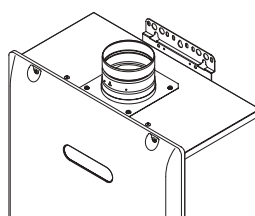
Location of mounting screws and the Exhaust Adapter.
